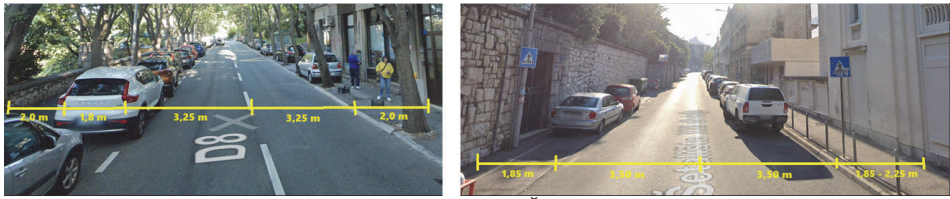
Street profile: Janka Polić Kamova Street (left) and Šetalište 13. divizije Street (right)
